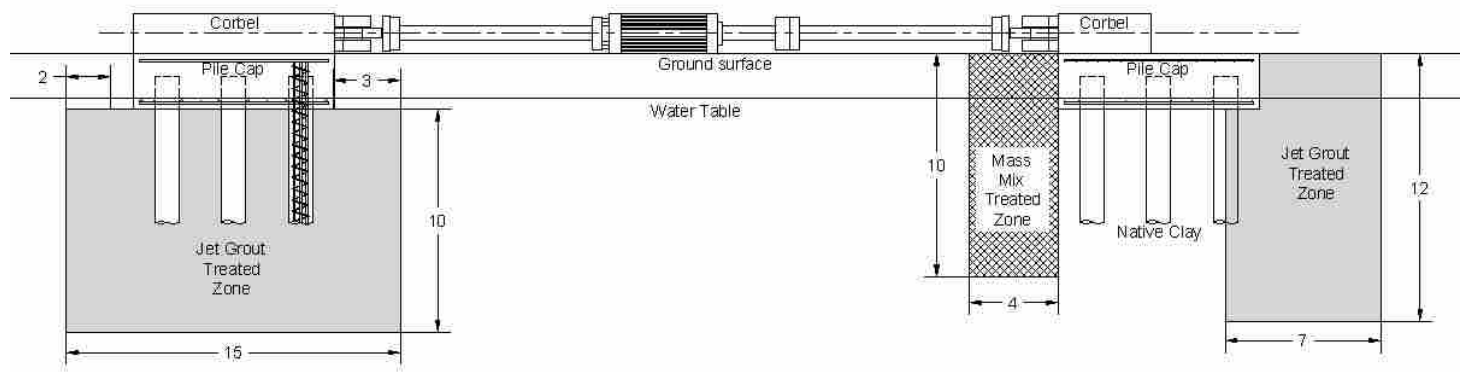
Profile views of cap 2 (left) and cap 1 (right) after mass mixing and jet grouting soil improvements. (Dimensions in feet)
